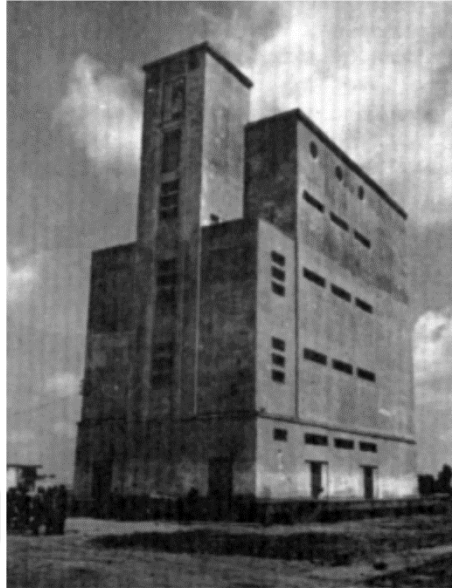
The five-storey silo building, constructed with reinforced concrete, was able to withstand the seismic forces (Minami, J.K., 1965).
